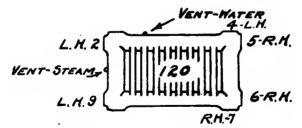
Assembled in two or more stacks. One and two pipe steam only. Bottom feed only.
